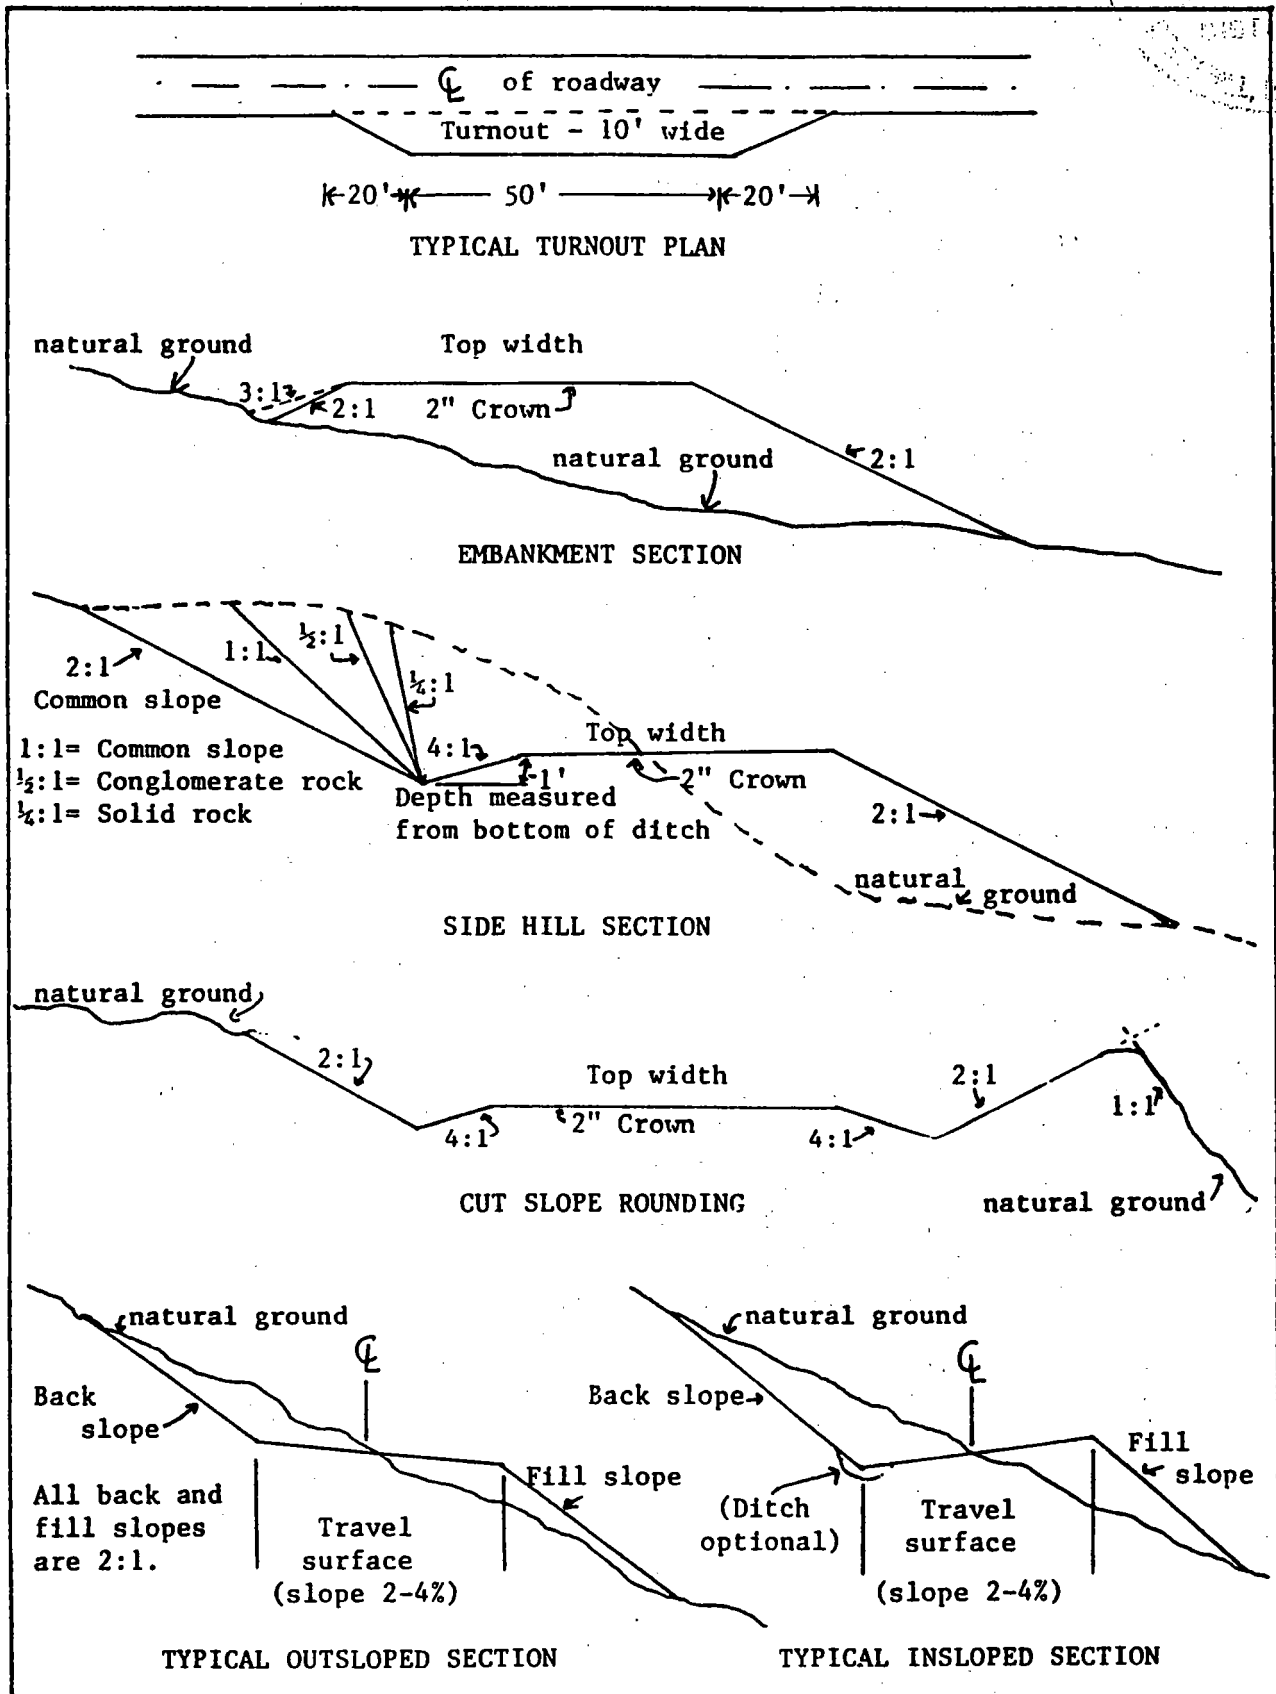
CROSS-SECTIONS AND PLANS FOR TYPICAL ROAD CONSTRUCTION REPRESENTATIVE OF BLM RESOURCE, AND HIGHER CLASS, ROADS.
